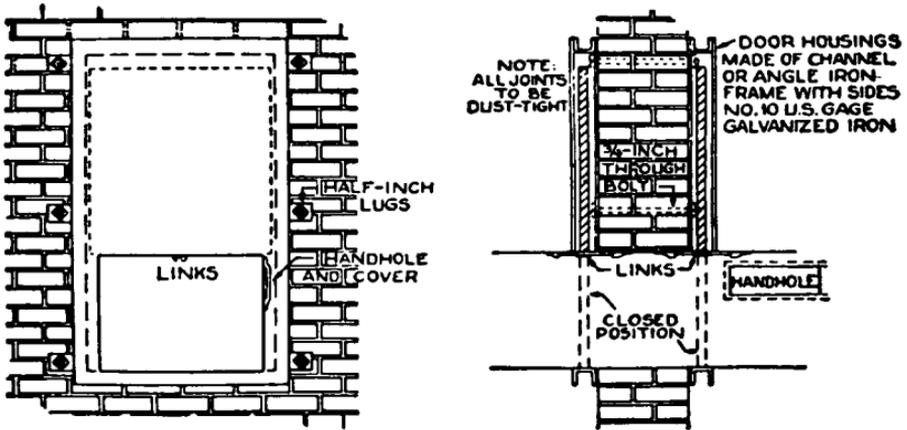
Suggested type of vertical fire door for duct passing through opening in fire wall
